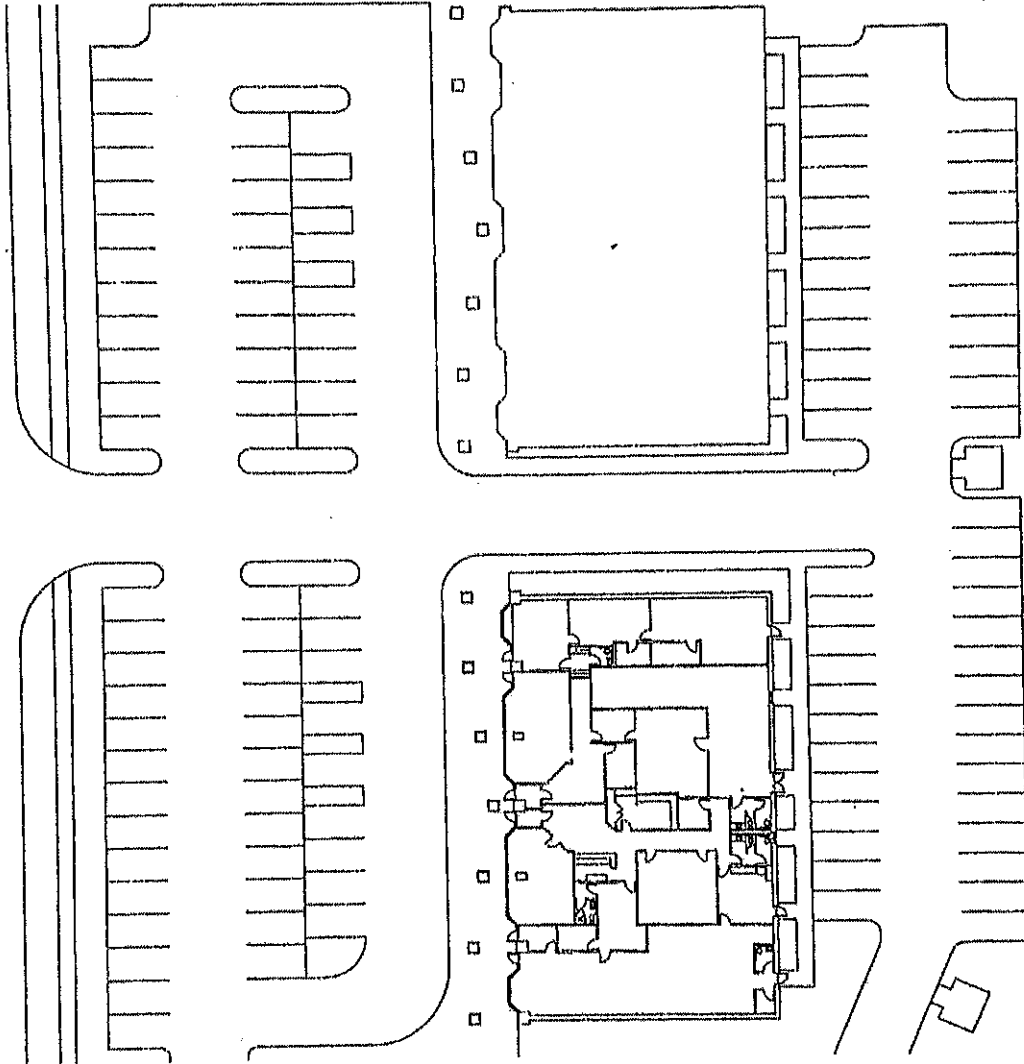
Commercial building and parking area at 1504 Essington Road (July 2024)
